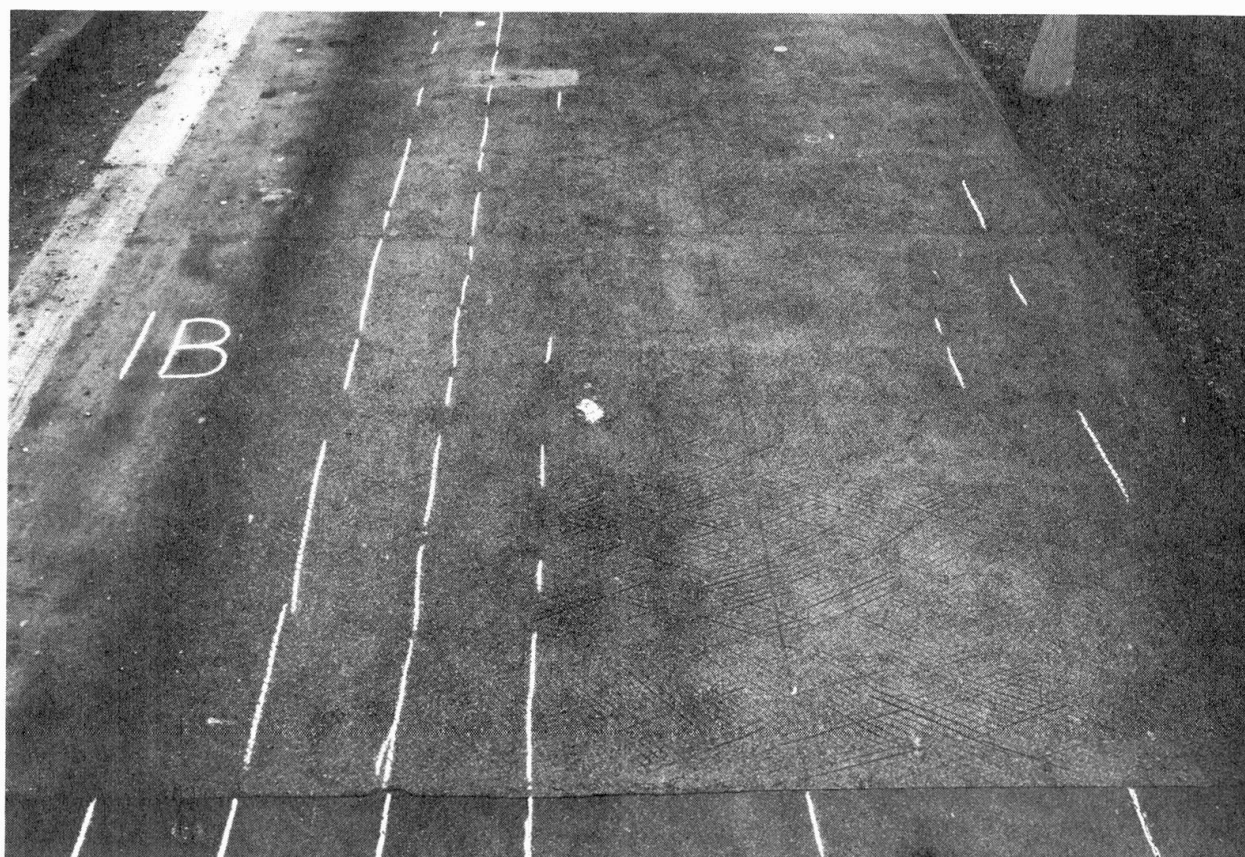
CRACKING IN EPOXY RESIN SURFACING ON SECTION 1B, NOVEMBER, 1967
